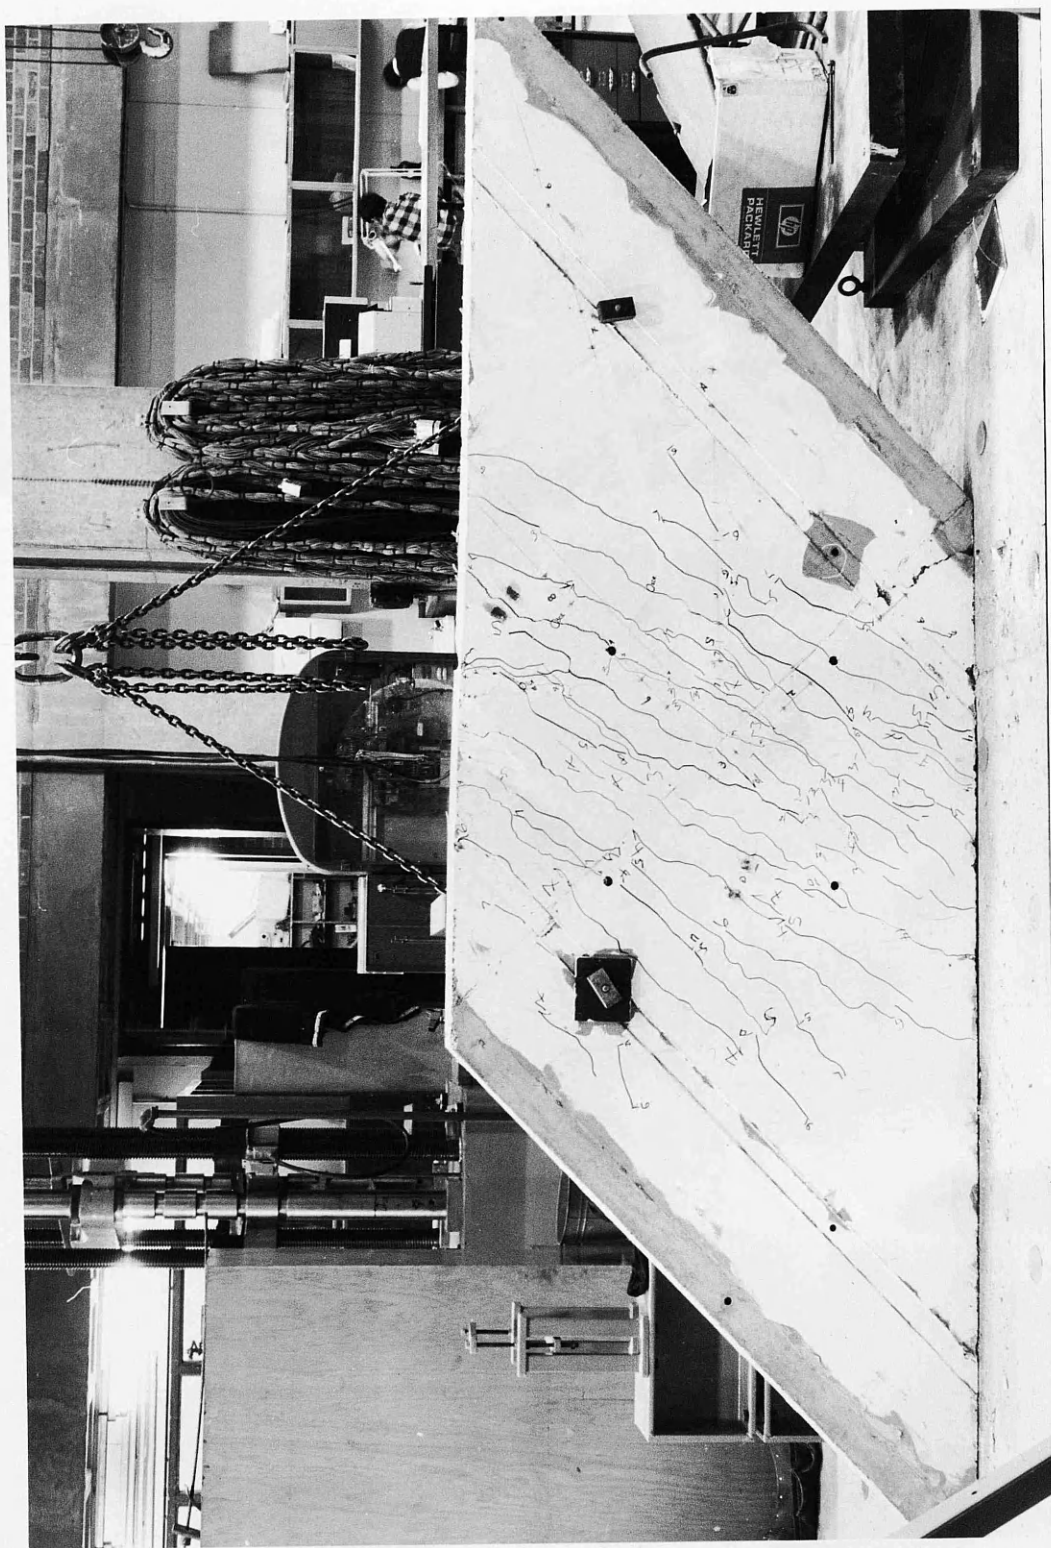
MODEL SKEW SLAB NO. (4) Soffit crack pattern after failure
